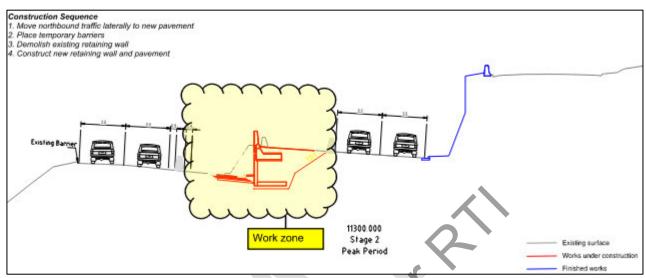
Section 2A Ch 11 300 - Stage 2 Peak Period
